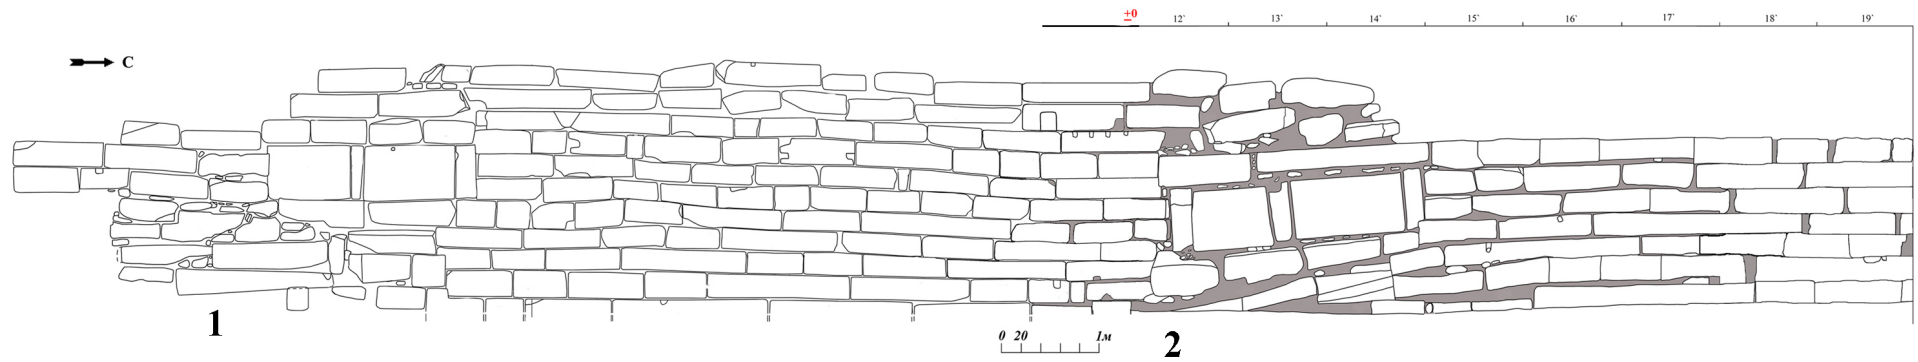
Monumental architectural structure on river Rubas. 1 – eastern façade of Wall No. 2; 2 – Structure No. 6
